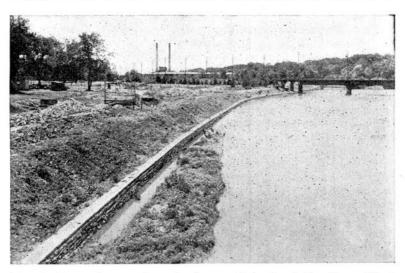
Downstream view showing east bank of the Iowa River at Iowa City, Iowa. The stone wall was constructed first and then the unsightly material in the river (foreground) was dredged. The Iowa Avenue Bridge is the second bridge in the background. 1935.
